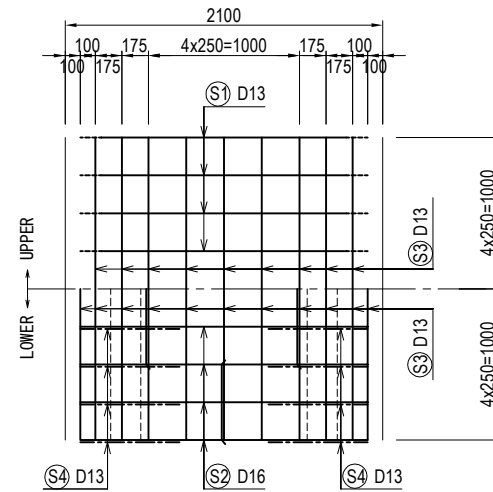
DETAIL OF BOX CULVERT TYPE 1500 x 1500
